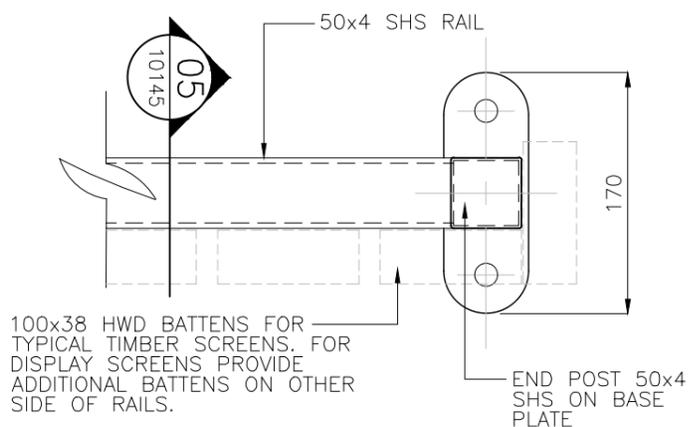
RAIL END CONNECTION TO SHELTER POST – SECTION
